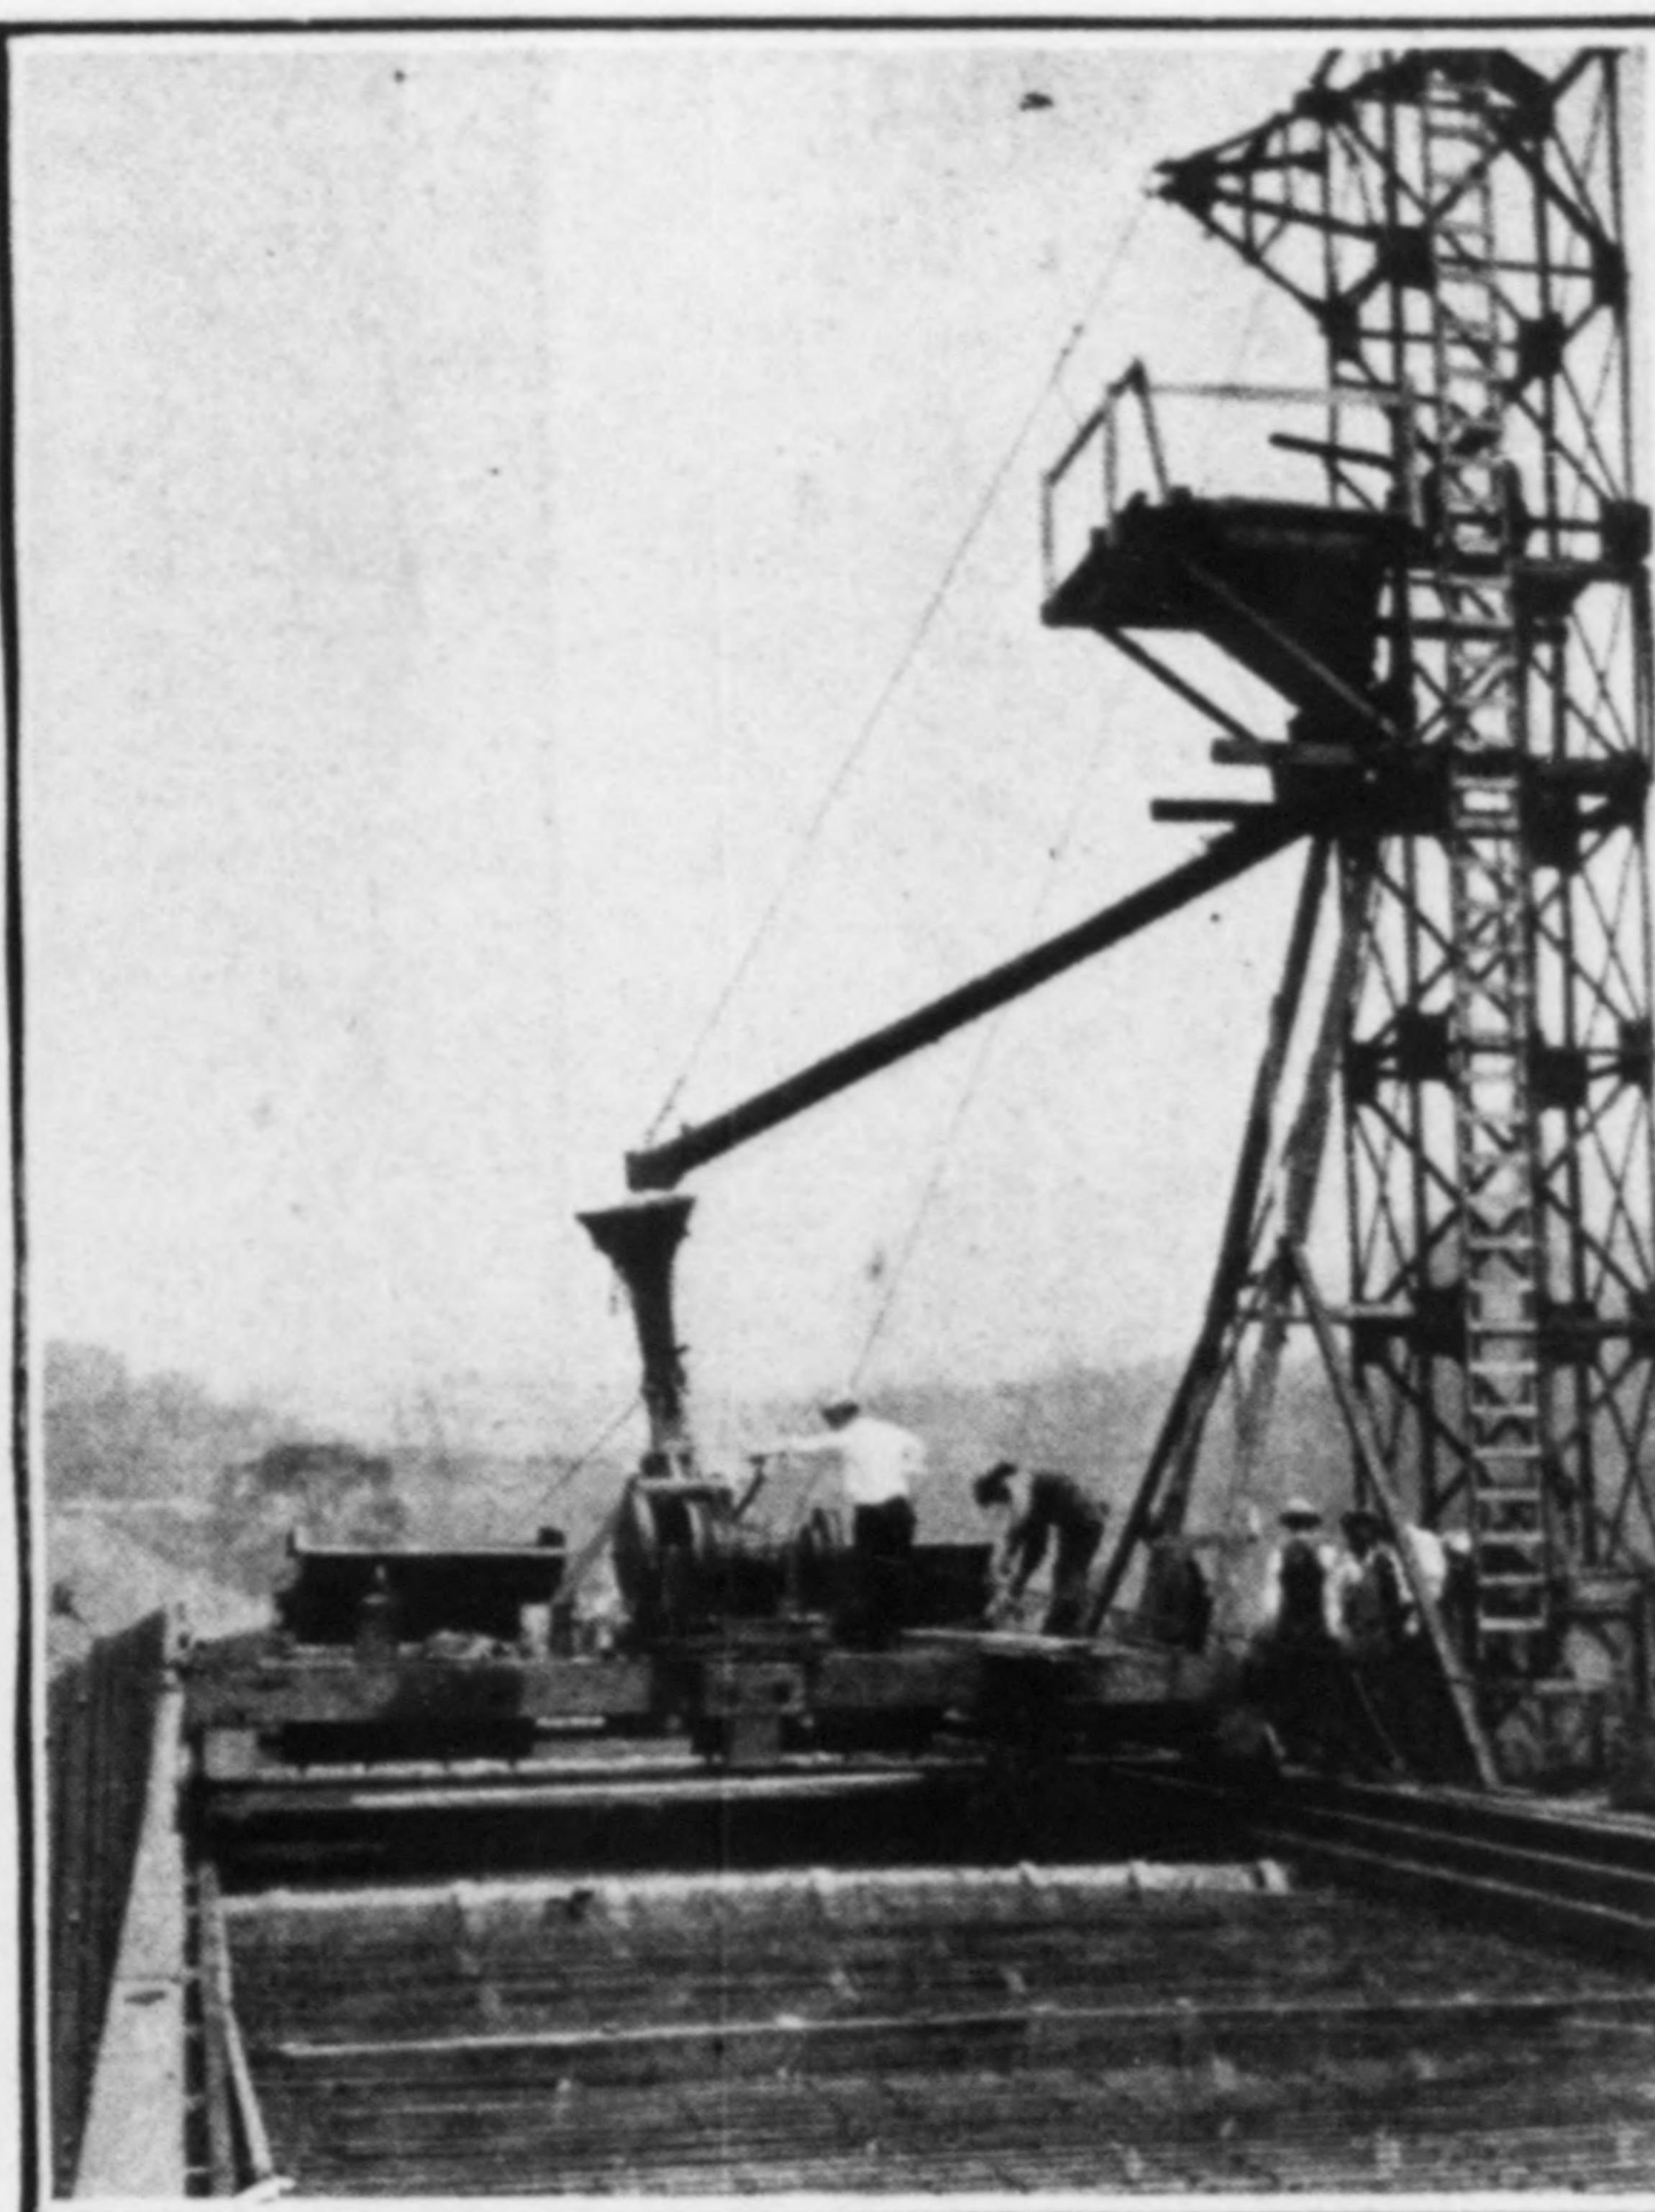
FLOOR CONSTRUCTION ON THE STEUBENVILLE BRIDGE
